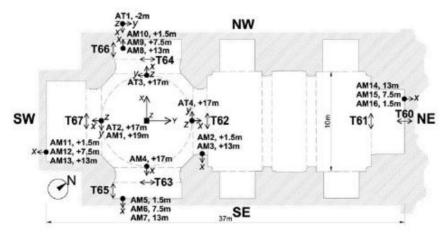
Measurement equipment installed in the Church of Anime Sante.
